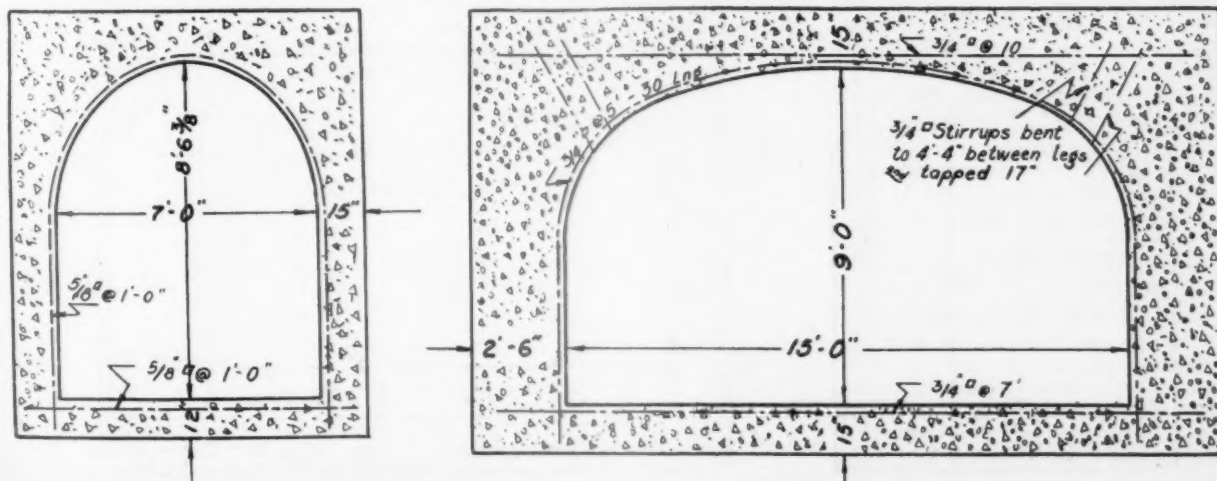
7-ft. and 15-ft. sections, 1775 level, No. 2 shaft
